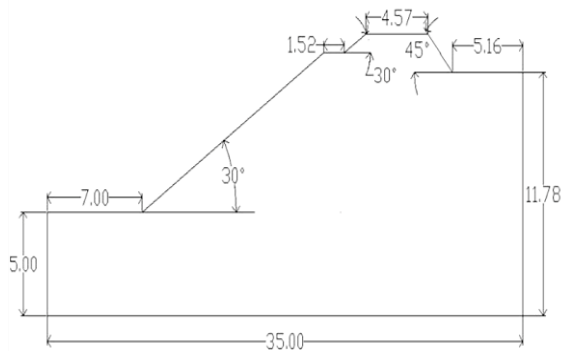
Geometric model of slope at Jahajghat location of Rajshahi city protection embankment, Bangladesh
